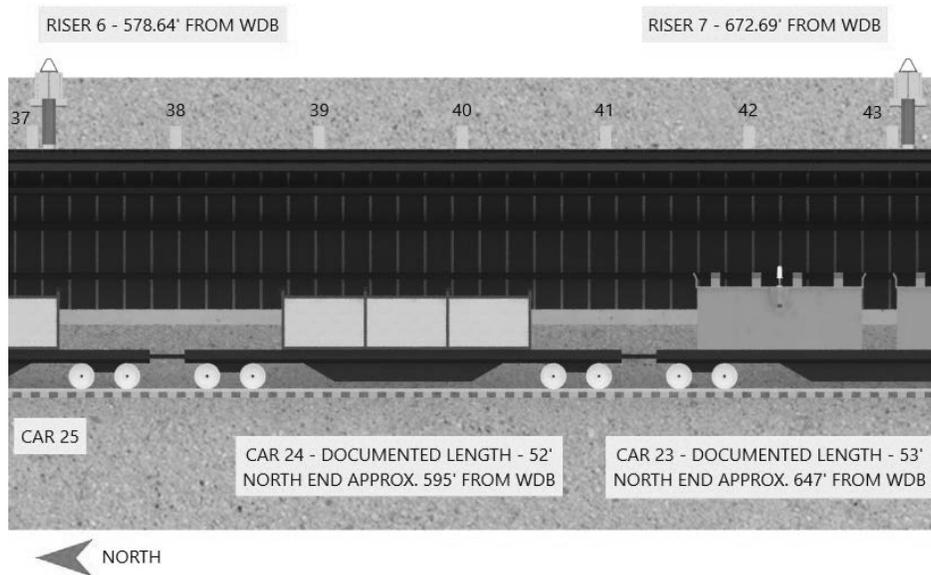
Riser 6 to Riser 7 Tunnel Section.
